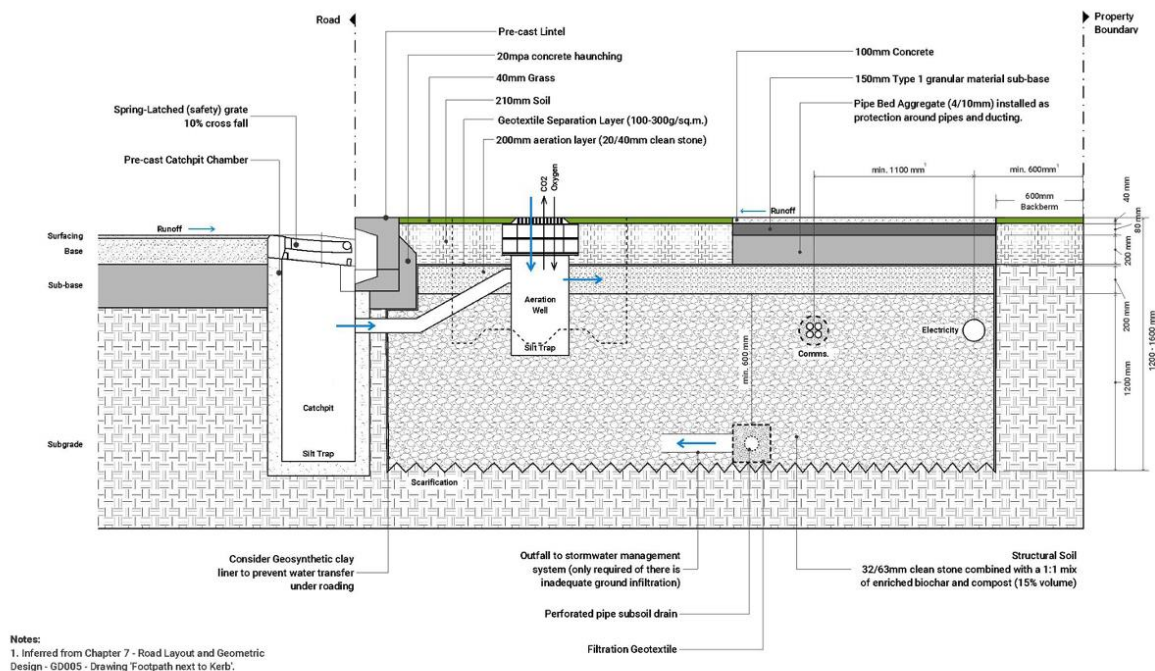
Draft section of Tree Pit – Kerbside Catchpit (Longitudinal Section)
